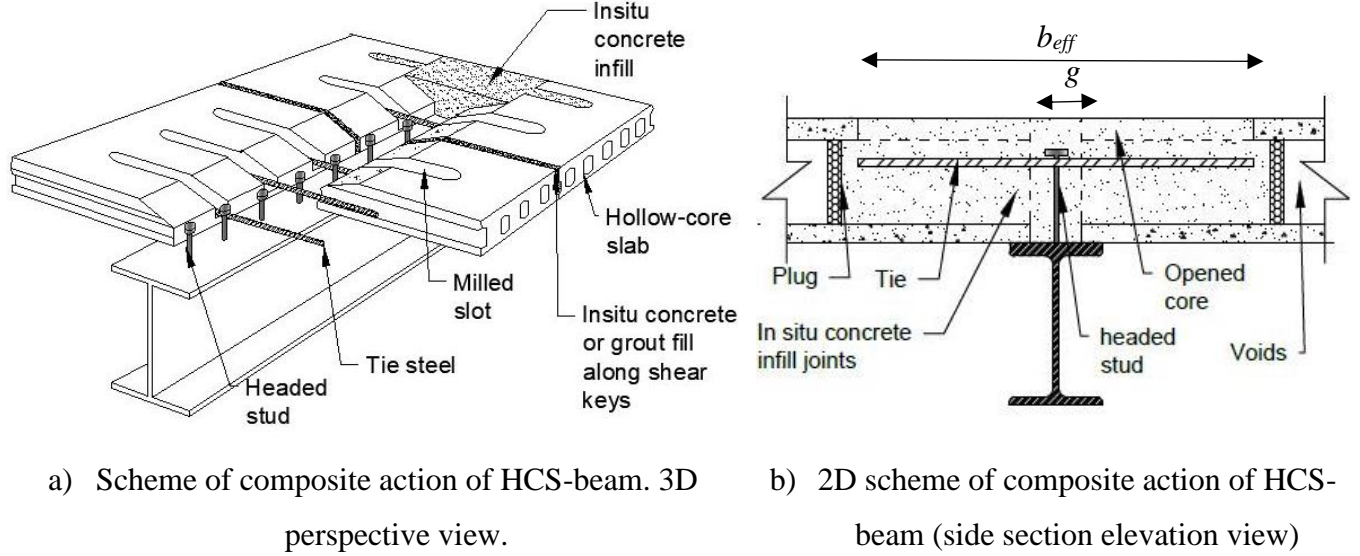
Composite beams with precast hollow core slabs - Reproduced from Lam et al. (2002)
